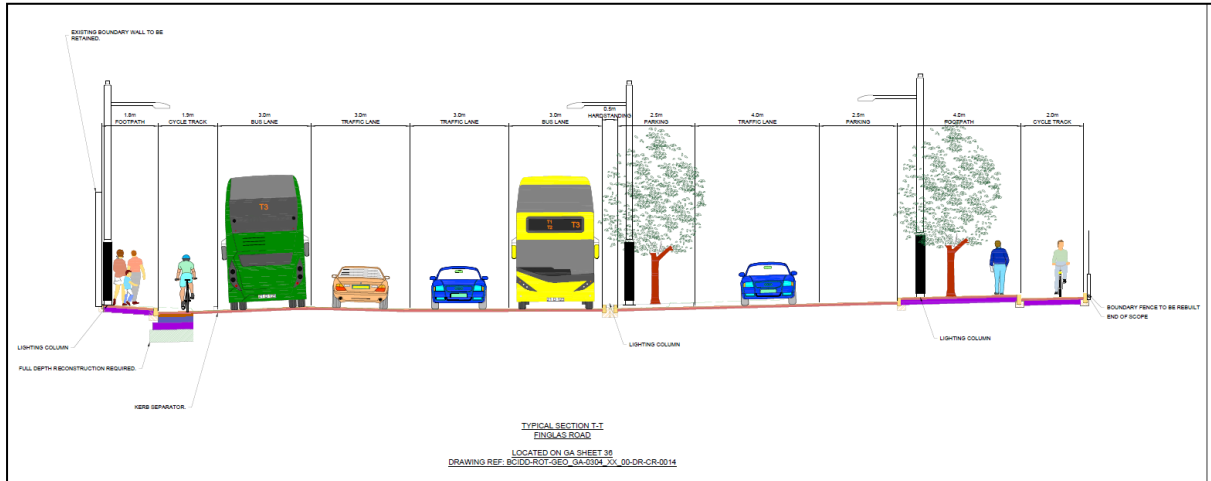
Extract from Typical Cross Sections Drawing Sheet 20 at Section T-T
